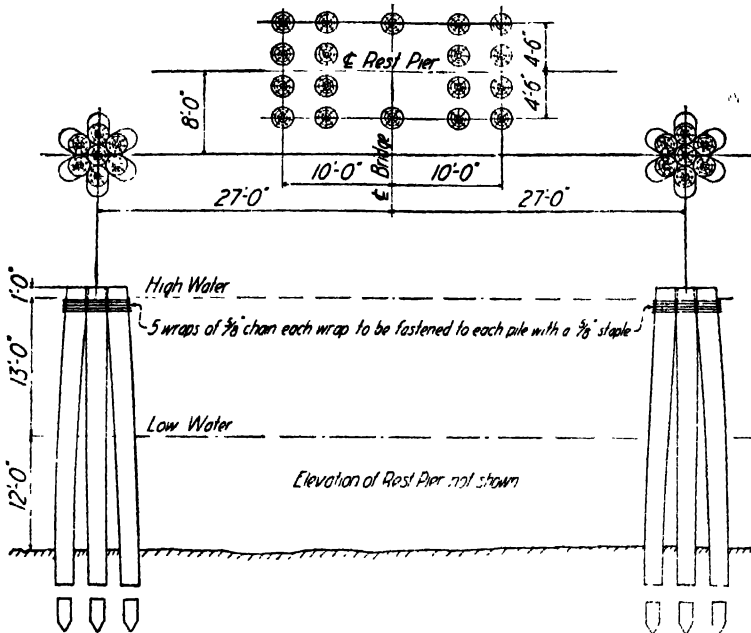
Fender Piles for the Lulu Island Bridge in British Columbia.
